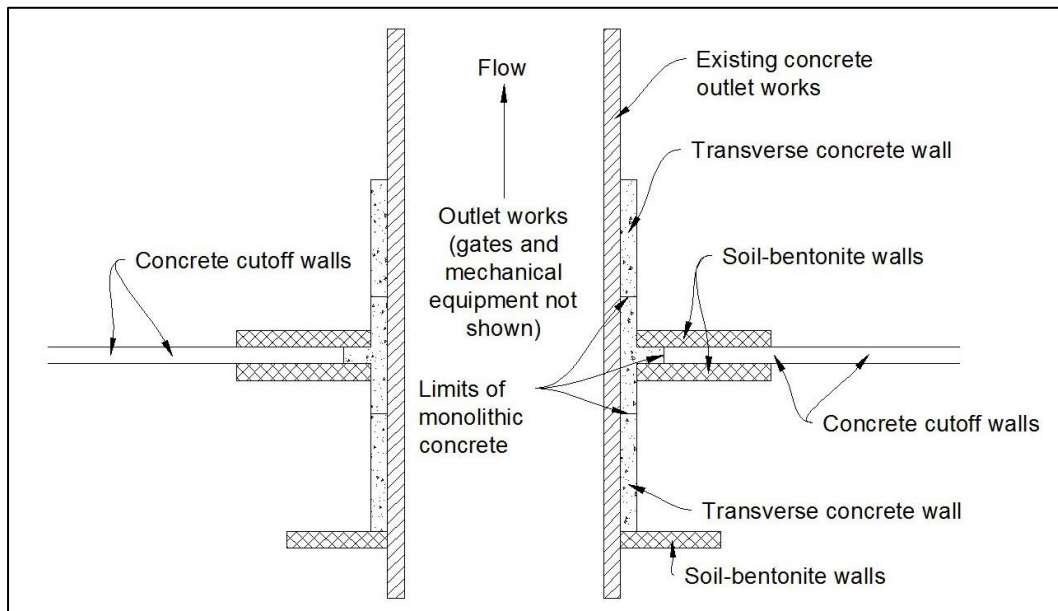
Example of concrete cutoff wall connection with outlet works conduit structure at Fontenelle Dam.
